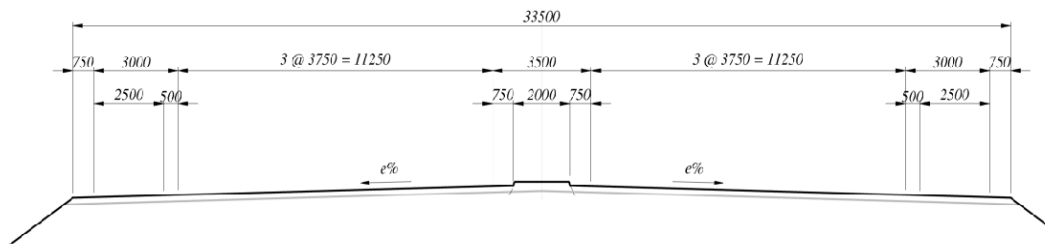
Typical Cross Section for CKE Earthwork (6-lane)
